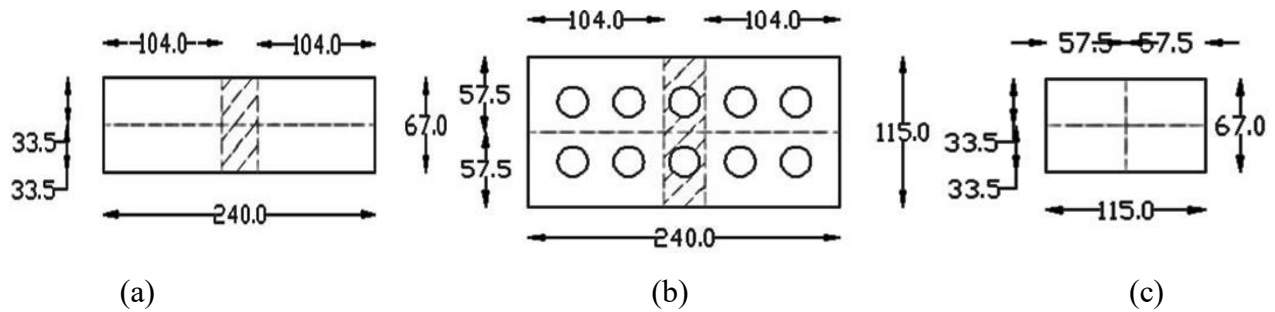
(a) Front / back elevation, (b) plan view, (c) side elevation of a full scale perforated clay brick (Every unit is in mm).
